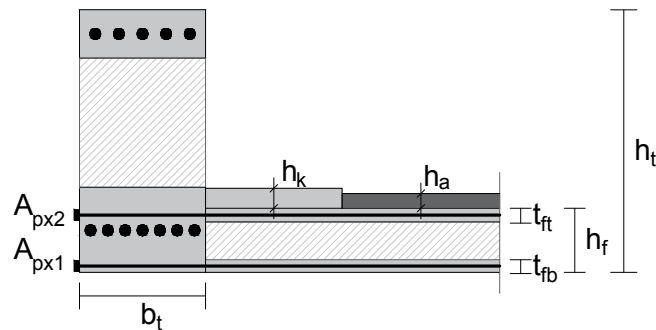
Detail for the floor-to-side connection in an open element trough bridge
